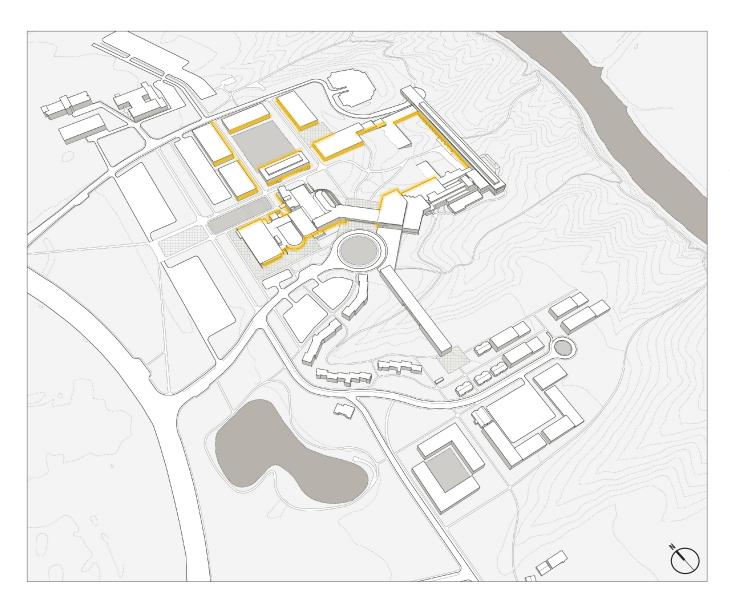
| BECTON DICKINSON CAMPUS CENTRE (Design Precedent)
